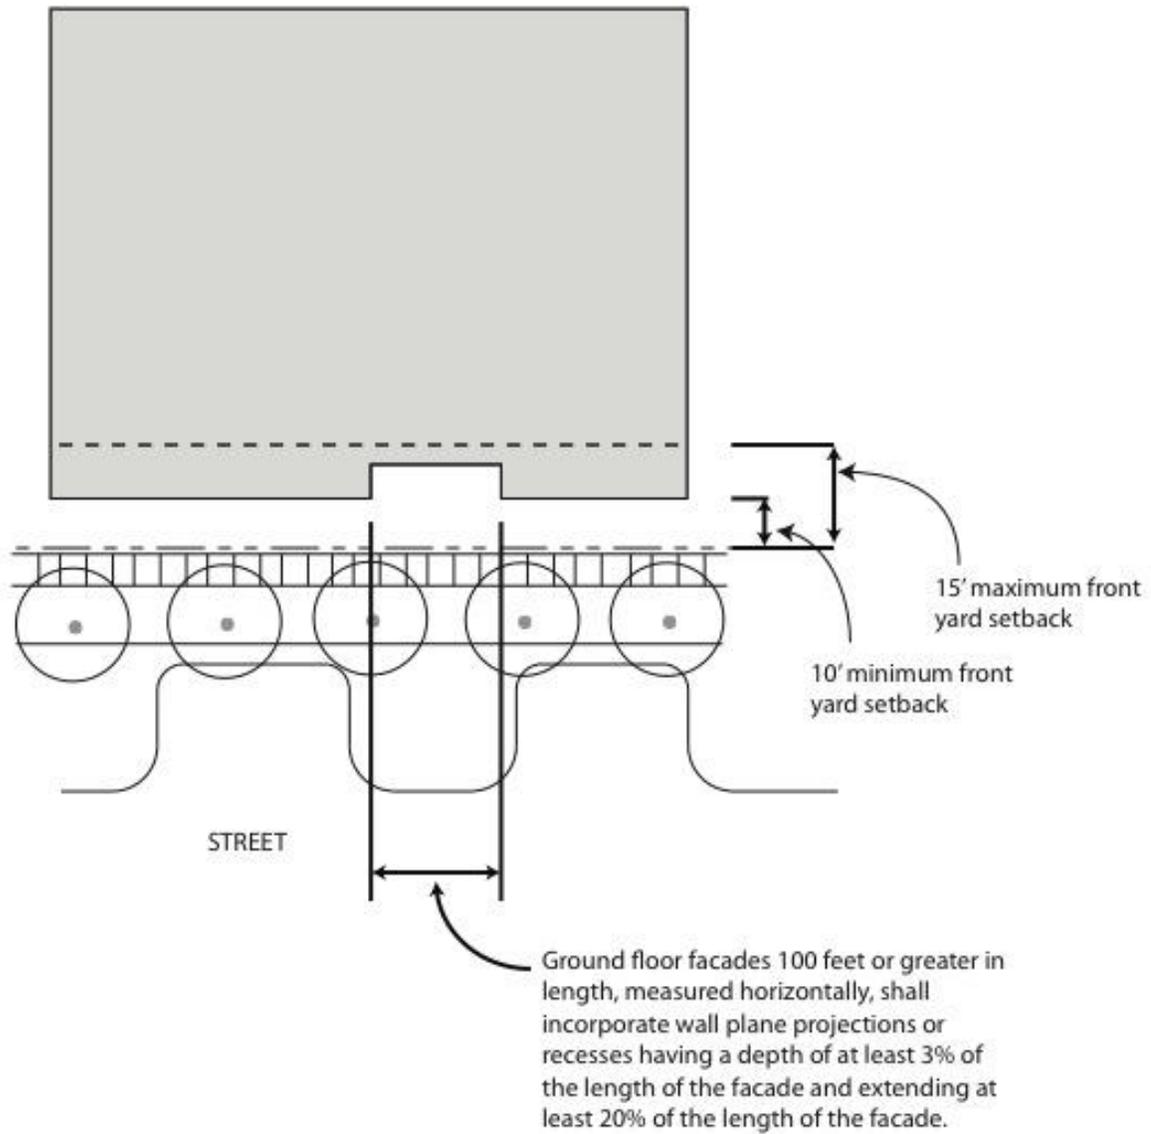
Front Yard Setbacks and Exterior Wall Articulation Diagram- not to scale
